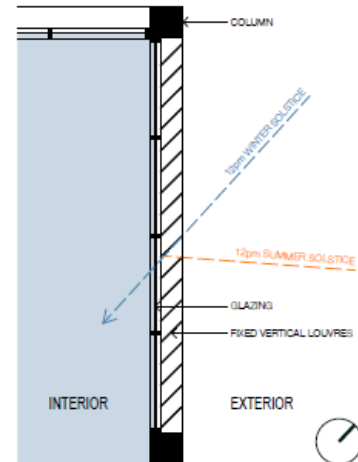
PLAN - East Facade - Fixed Vertical Louvres
